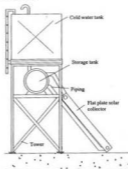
Layout of a typical thermosyphon solar water heater installed on a flat roof
